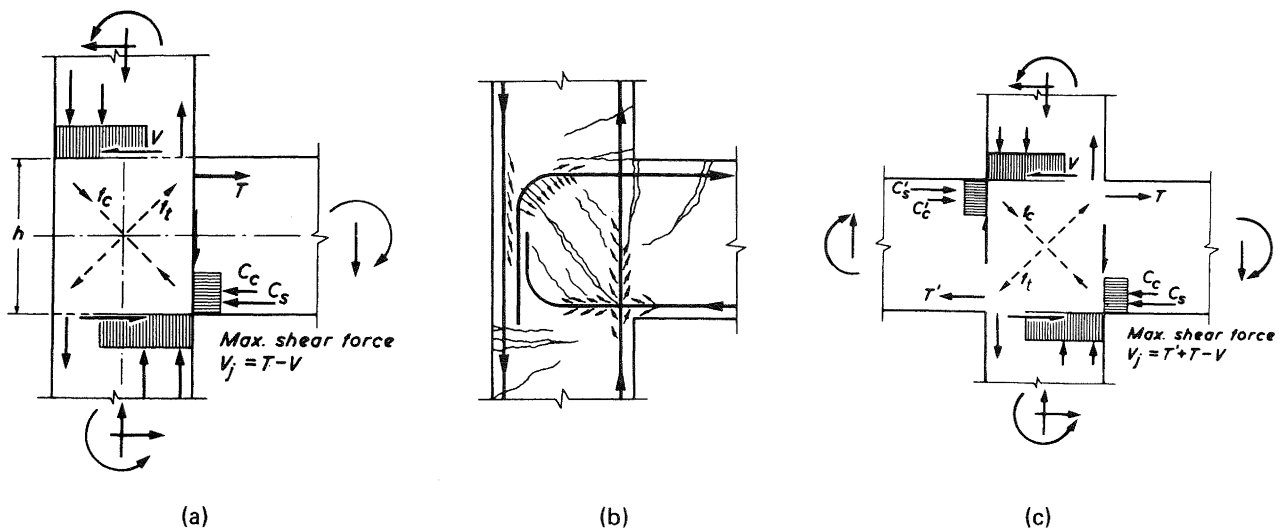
Reinforced Concrete Beam-Column Joints of Frame with Seismic Loading: (a) Actions and Stress Resultants of Exterior Joint, (b) Crack Pattern and Bond Forces at Exterior Joint, and (c) Actions and Stress Resultants at Interior Joint.
